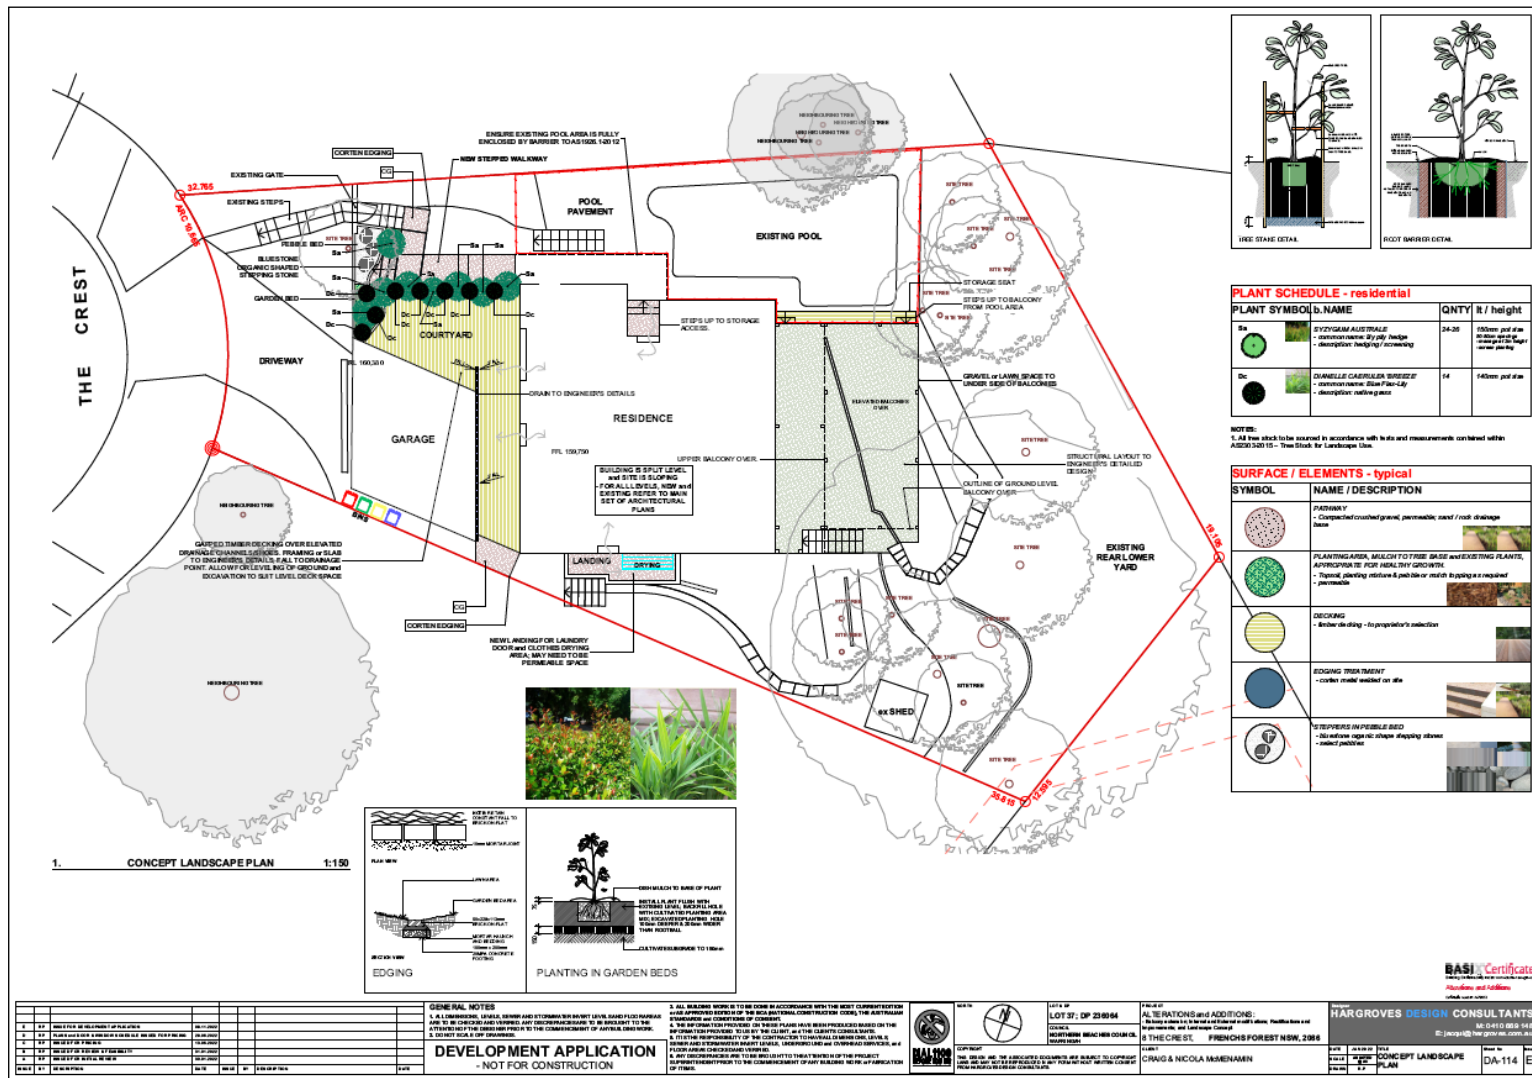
Plans/Elevations/Sections/Landscape Concept as per lodged DA submission.
